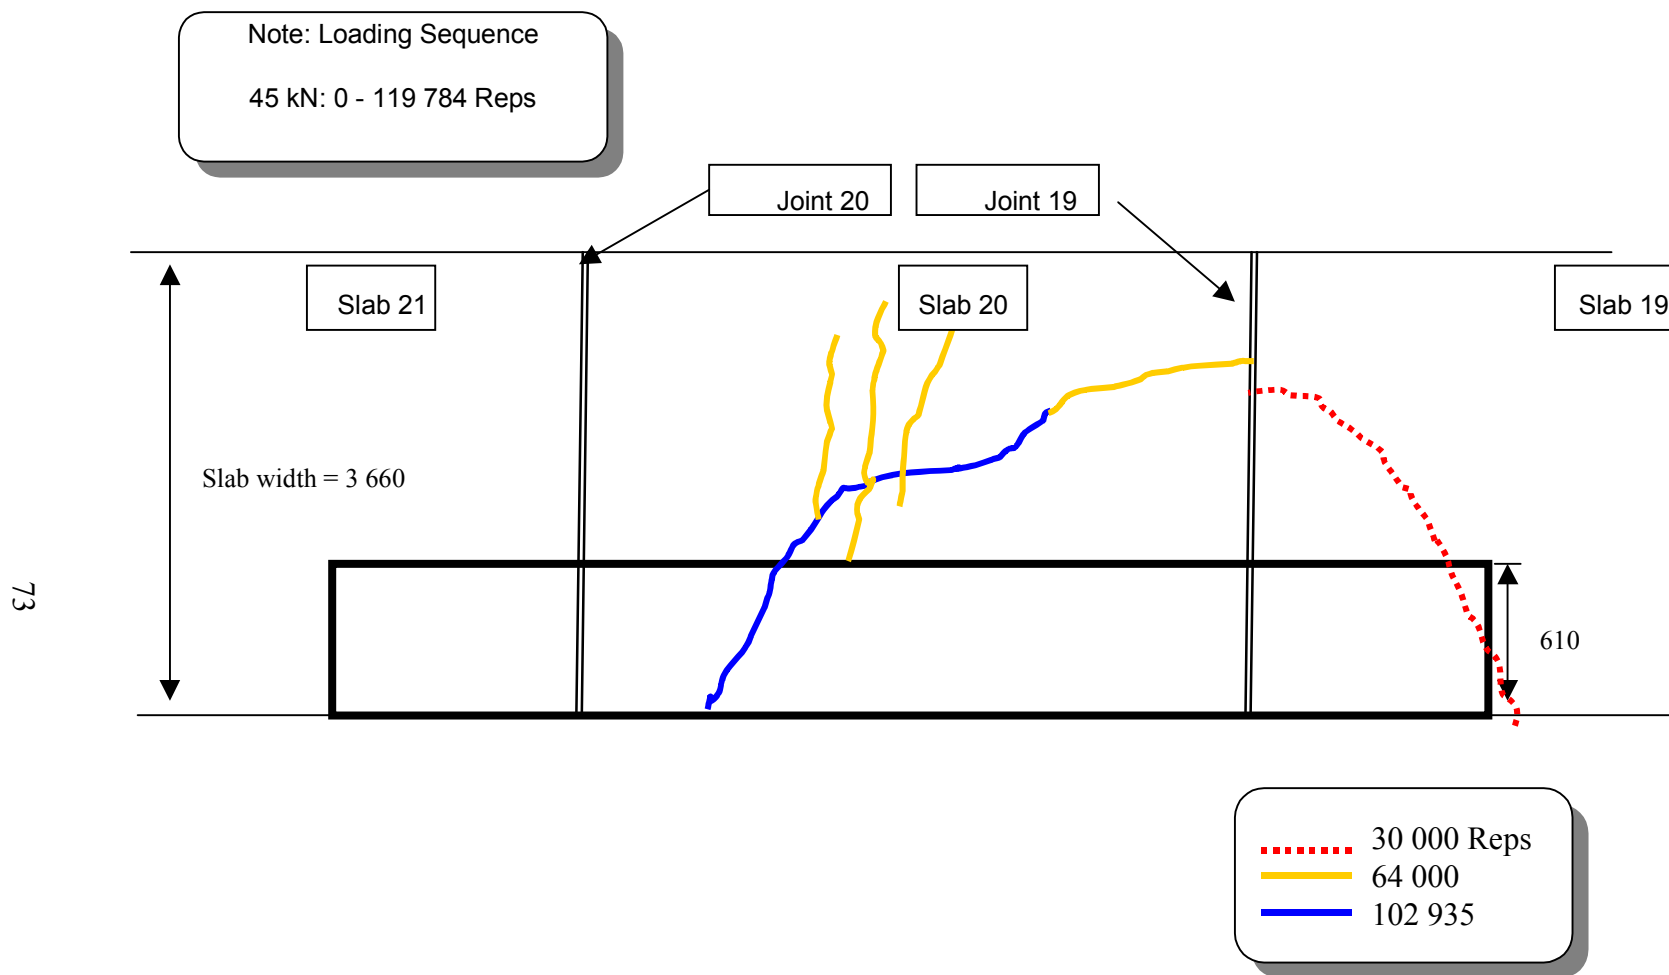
Schematic of crack development, Test Section 524FD (not to scale).
